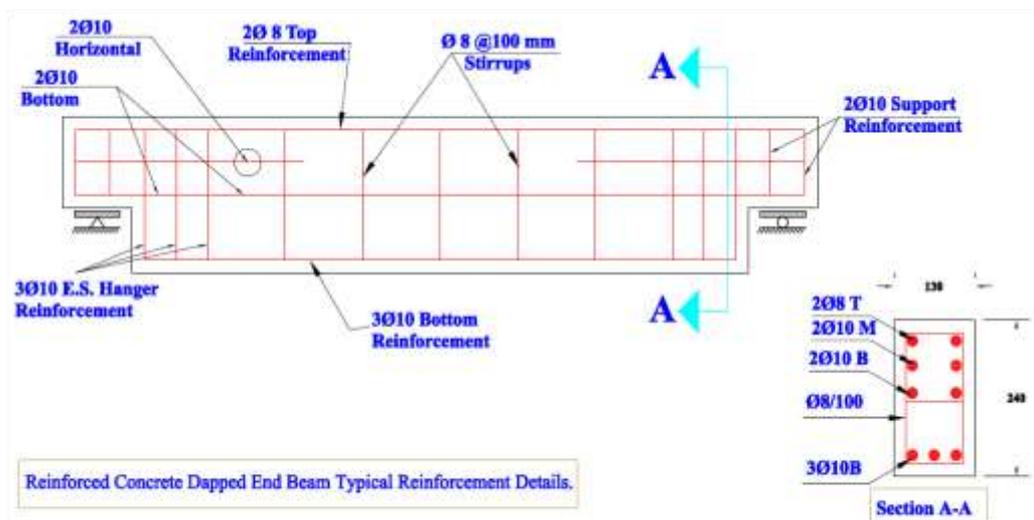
Reinforcement Details of R.C. Beam Dapped Ends.
